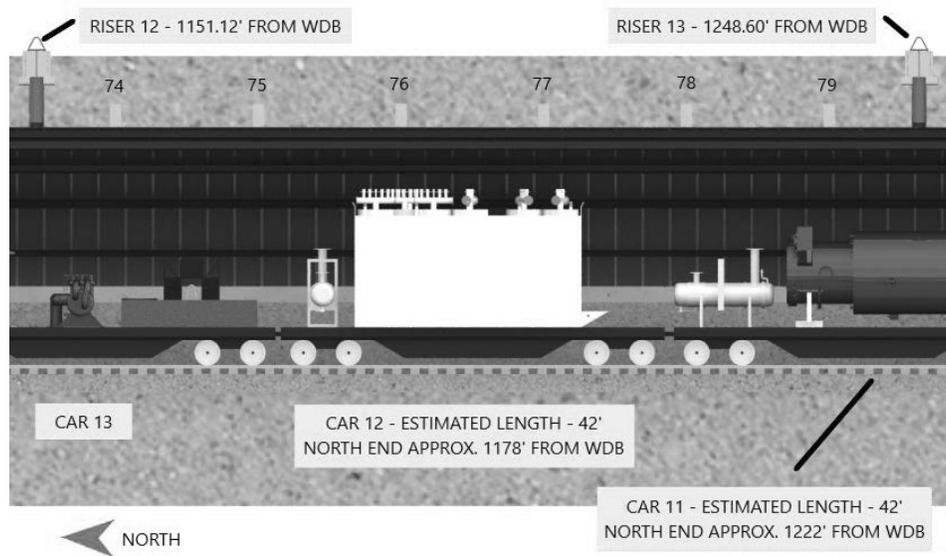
Riser 12 to Riser 13 Tunnel Section.
